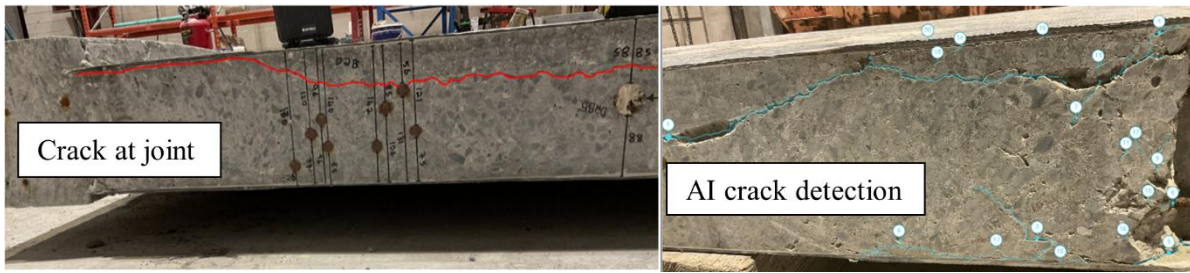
Severe cracks at diaphragm-girder joints a) 1.5-m long crack at the cold joint b) Spalled concrete and cracks detected by the INSPECT AI software
